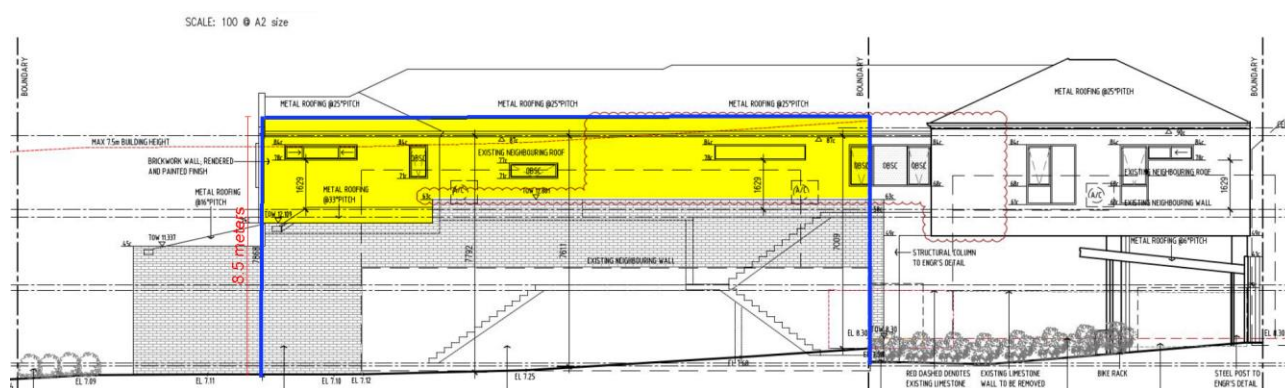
Proposed boundary wall for 108 Stirling Highway, shown as blue line superimposed over proposed DA plans for 110 Stirling Highway
